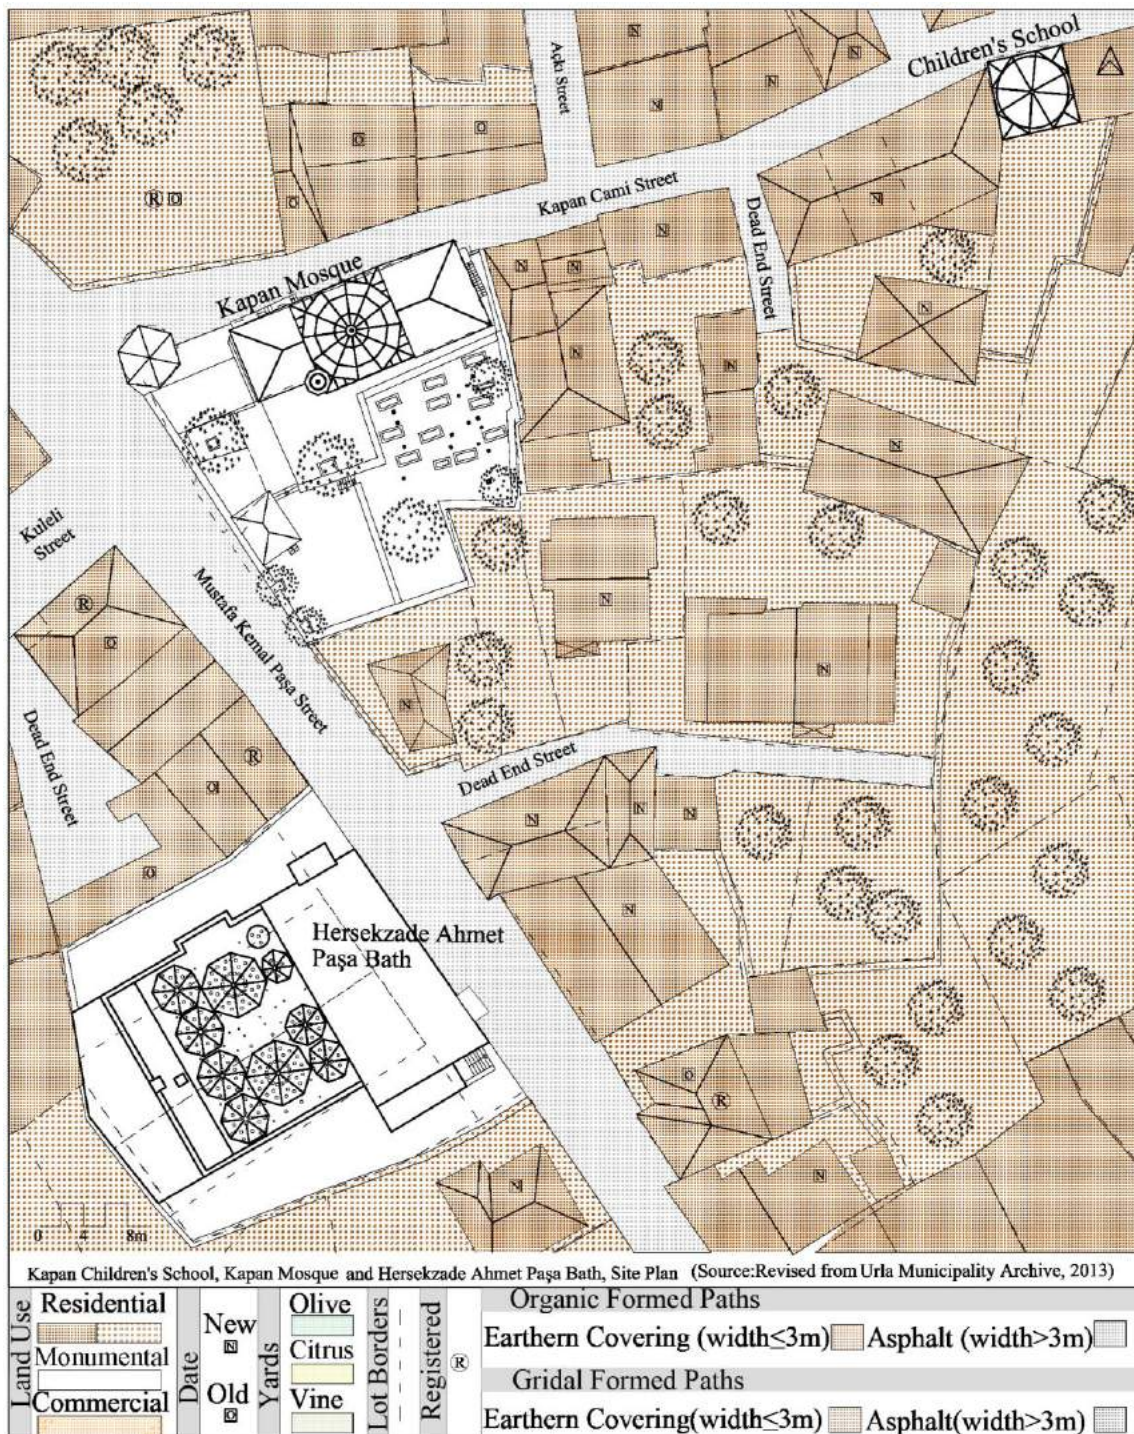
Site Plan, Kapan Building Group and Hersekzade Ahmet Paşa Bath
